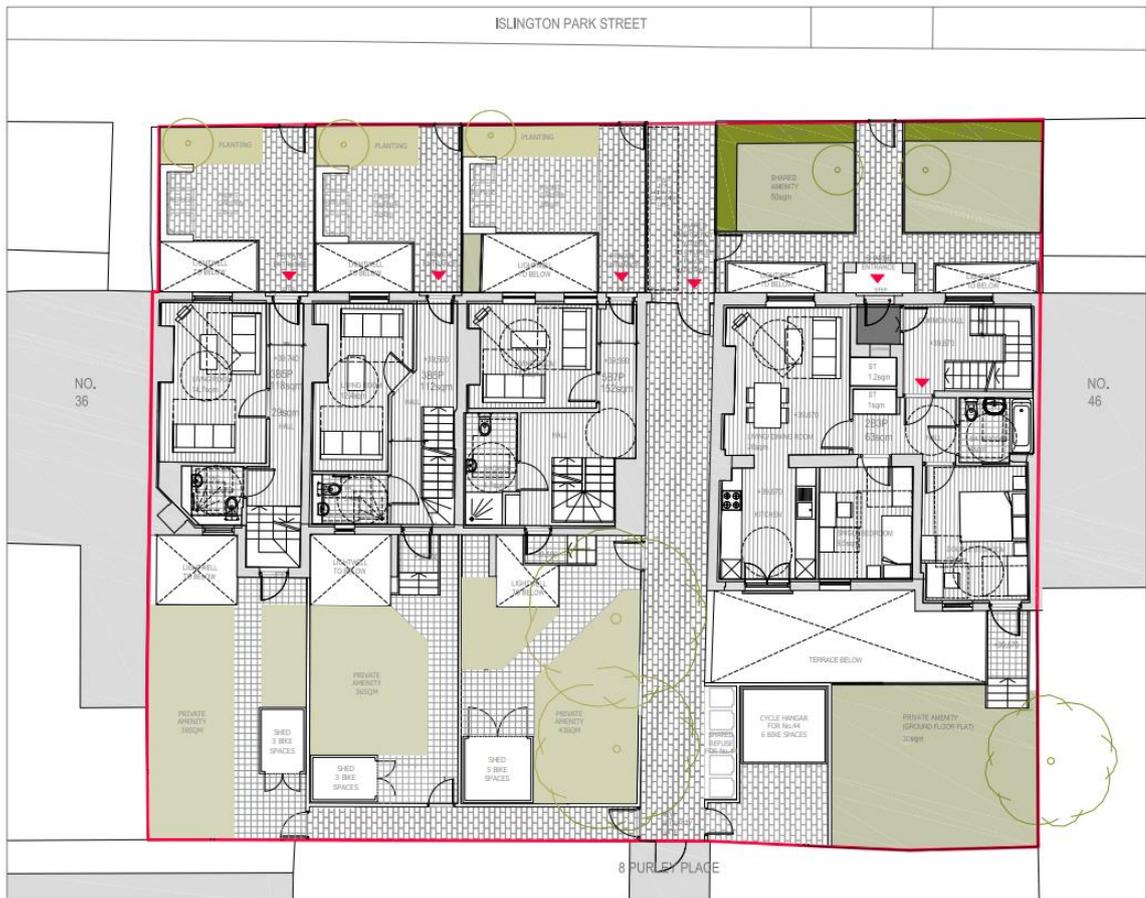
Revised Proposed Ground Floor Plan with amendments to refuse and cycle storage
